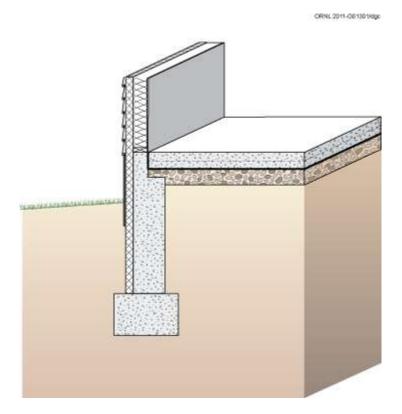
Slab-on-Grade Foundation with Exterior Insulation
